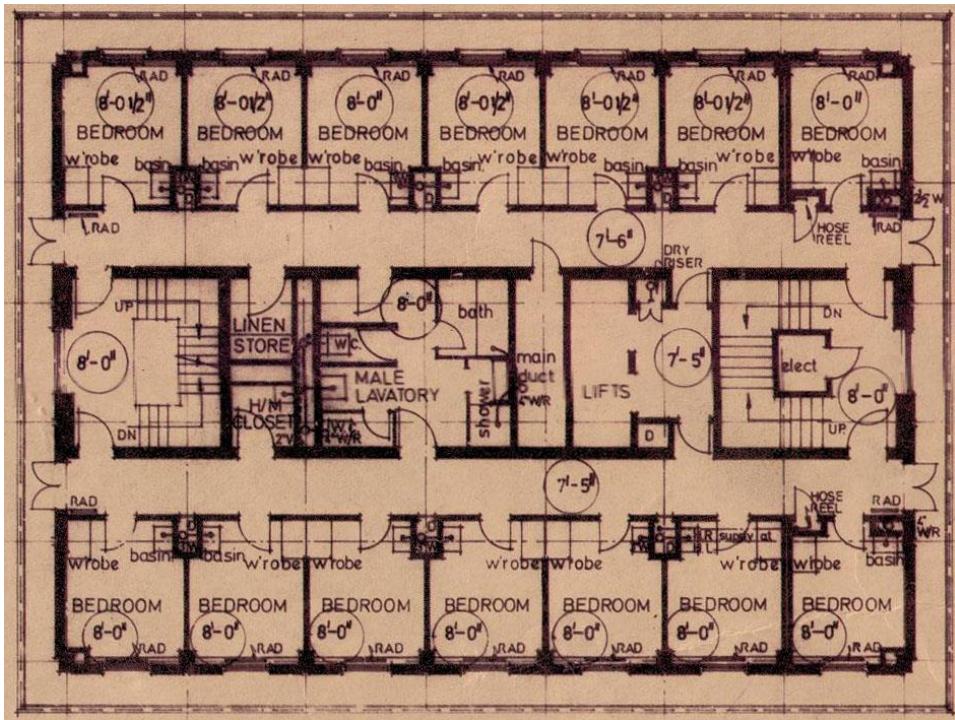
C. 1984 fifth floor plan, not to scale (Chief Engineer's Office, Metropolitan Police)
